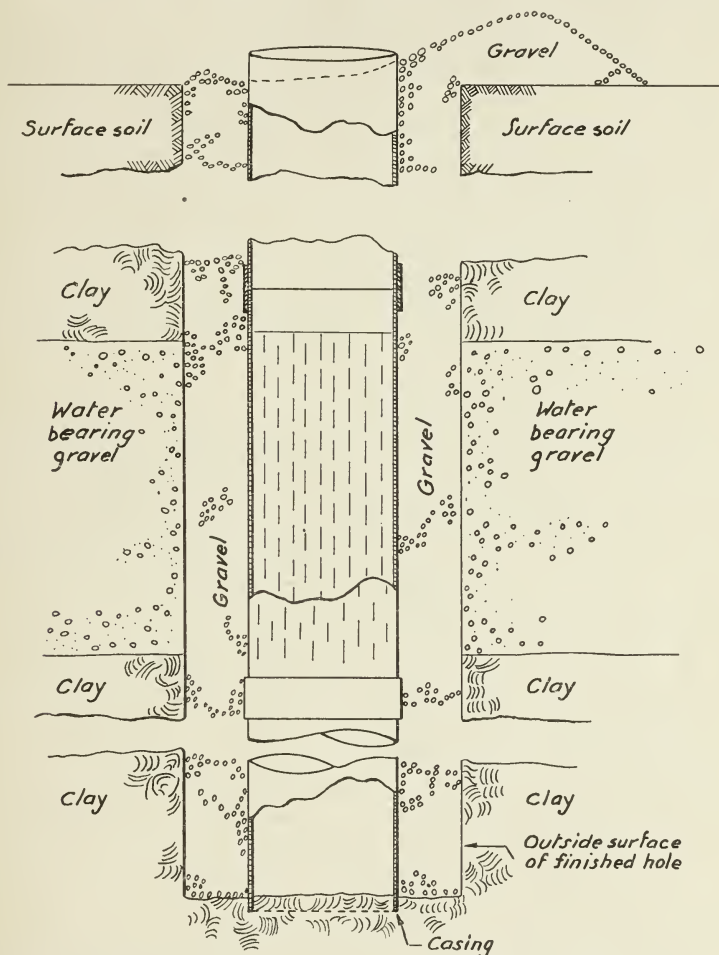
Typical section of rotary-drilled well, with gravel envelope and casing in place.
